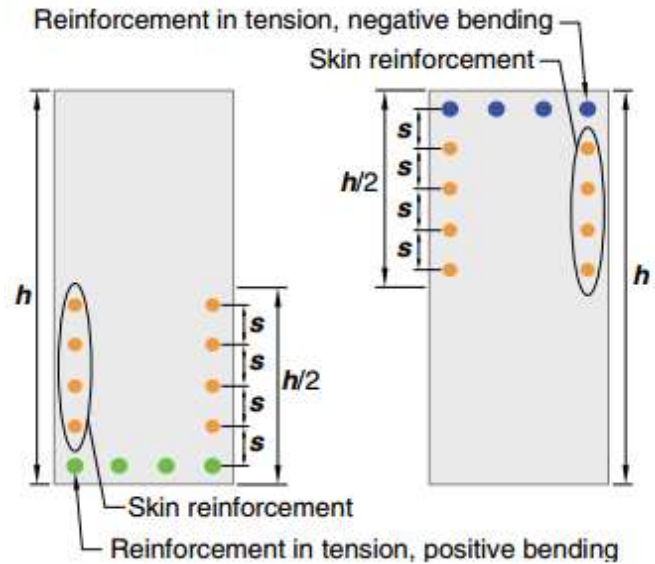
Skin reinforcement for beams and joists with  $h > 900 \text{ mm}$ .
